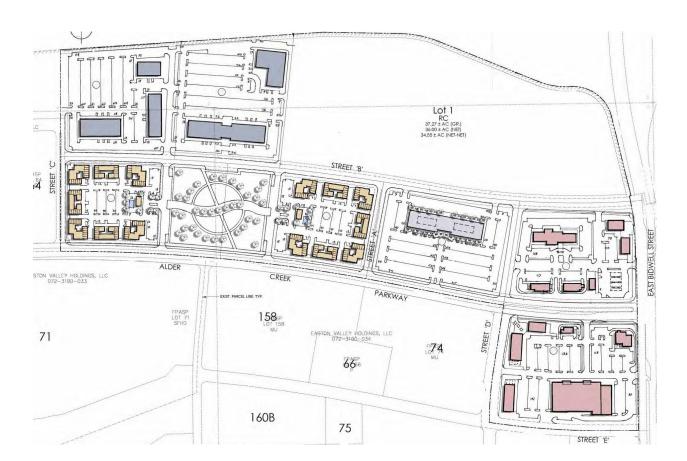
CONCEPTUAL SITE BUILDOUT ASSUMED IN TRAFFIC STUDY
